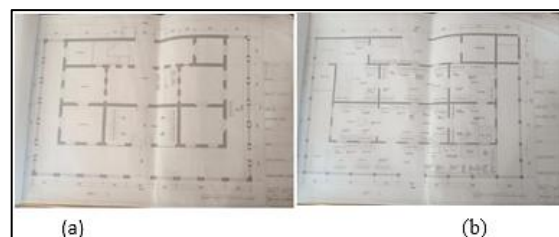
Floor Plan: (a) First Floor, (b) Second Floor of the Museum
